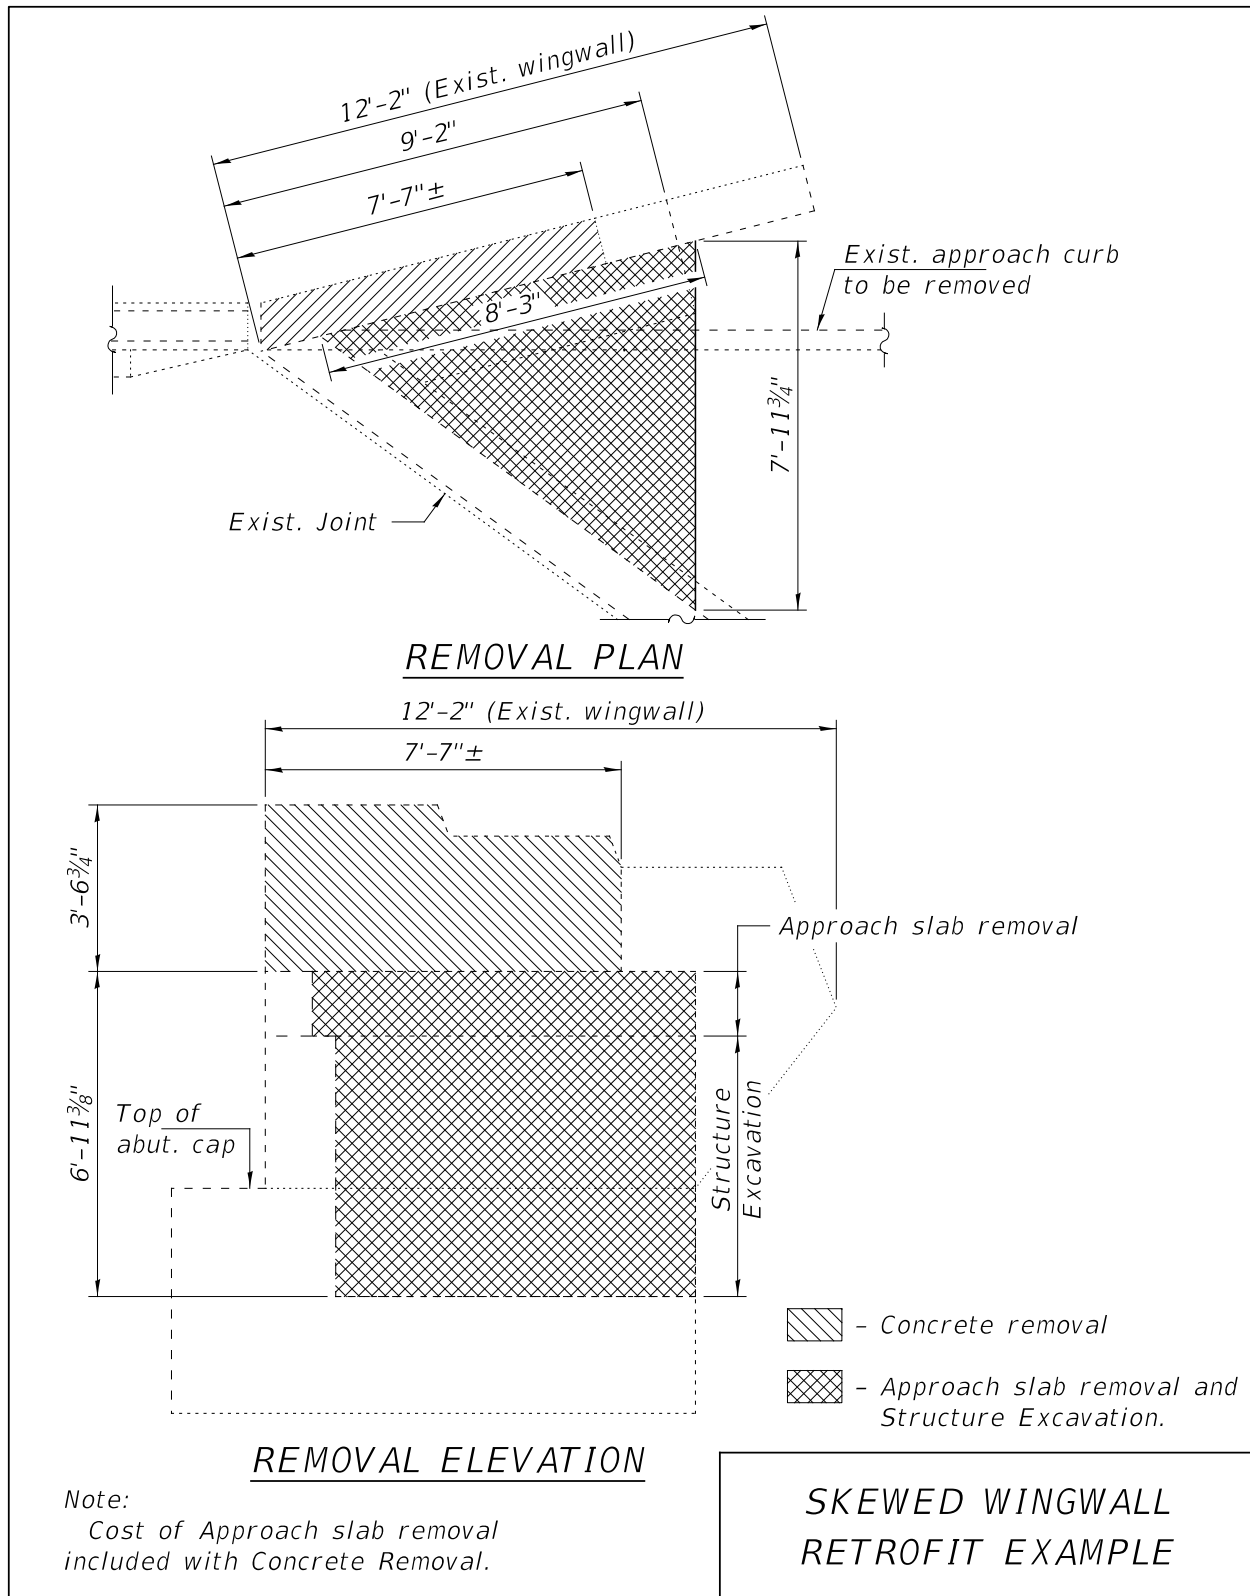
Example – Skewed Wingwall Retrofit
